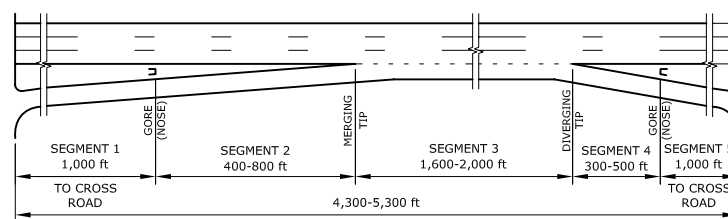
Dimensions of Ramp Components Between Crossroads (8)
